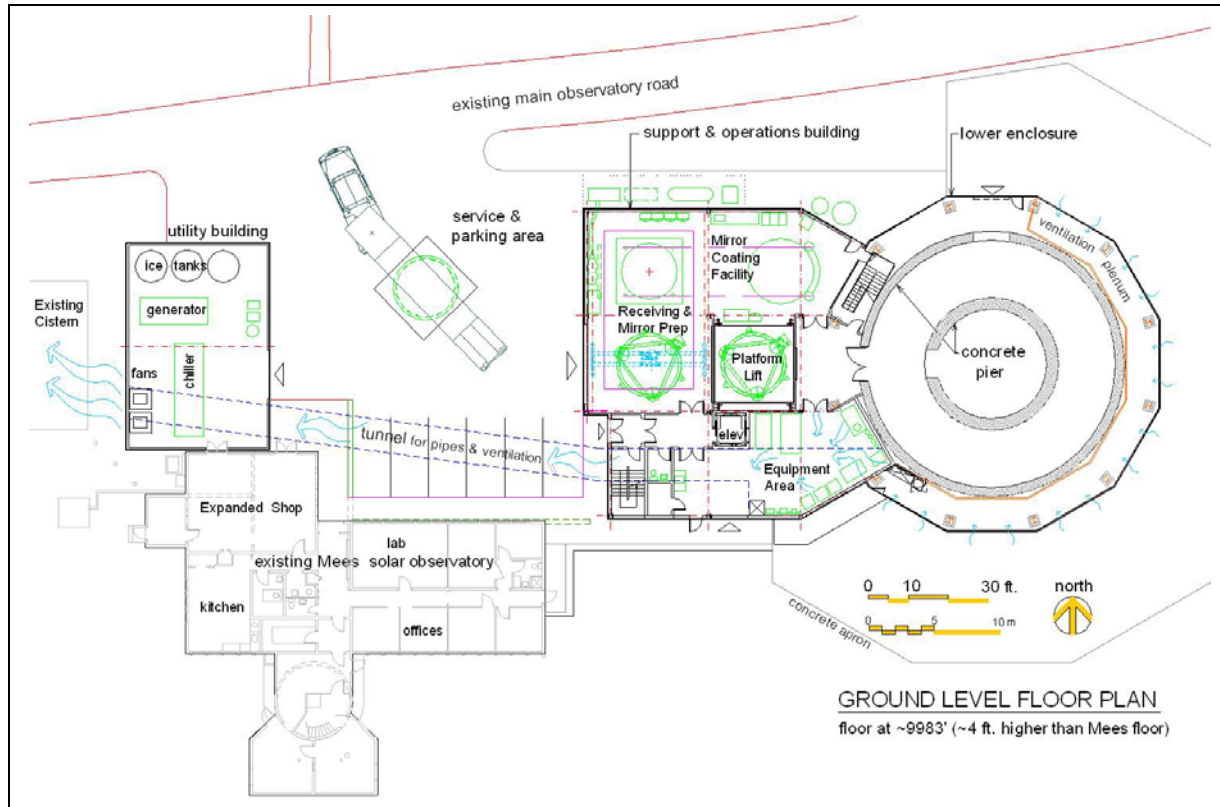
A ground-level floor plan of the ATST facility. The support building as three main levels: ground, mezzanine, and coudé/control-room.
